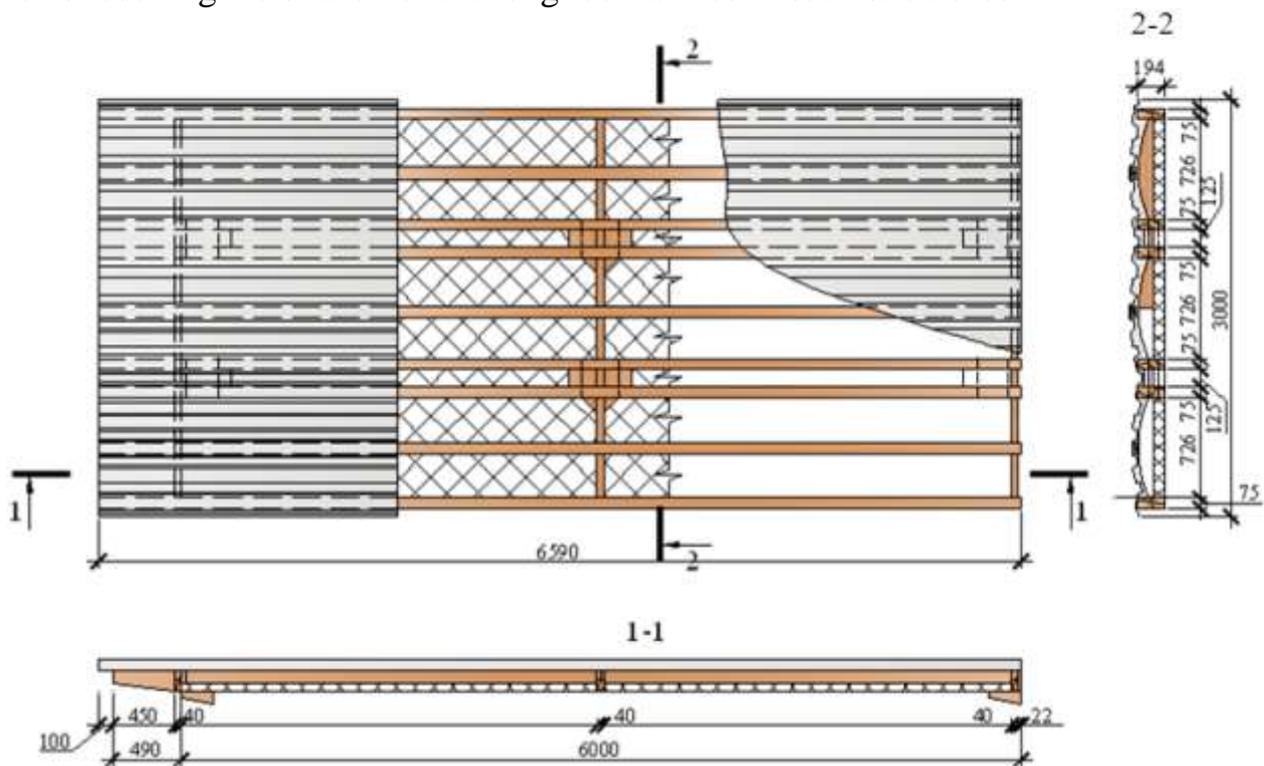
The coating slab 6x3 with the billowed boarding made of the profiled steel plate
